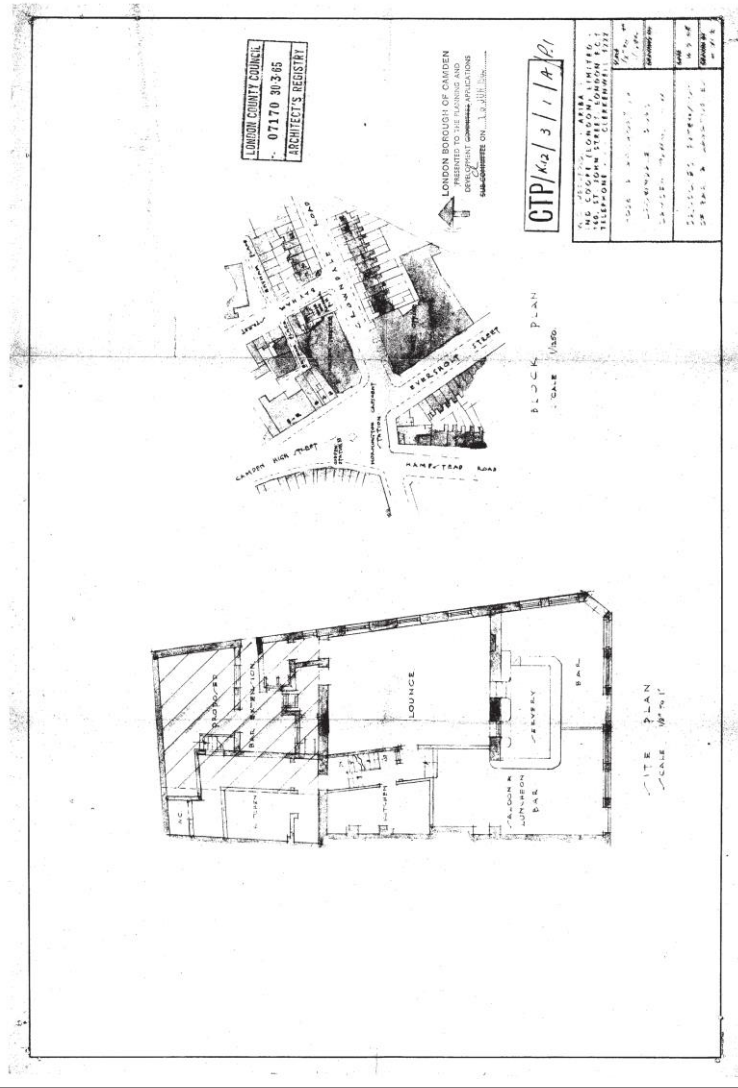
1965 Planning application drawing of floor plan – proposal for a bar extension to the rear of the pub
